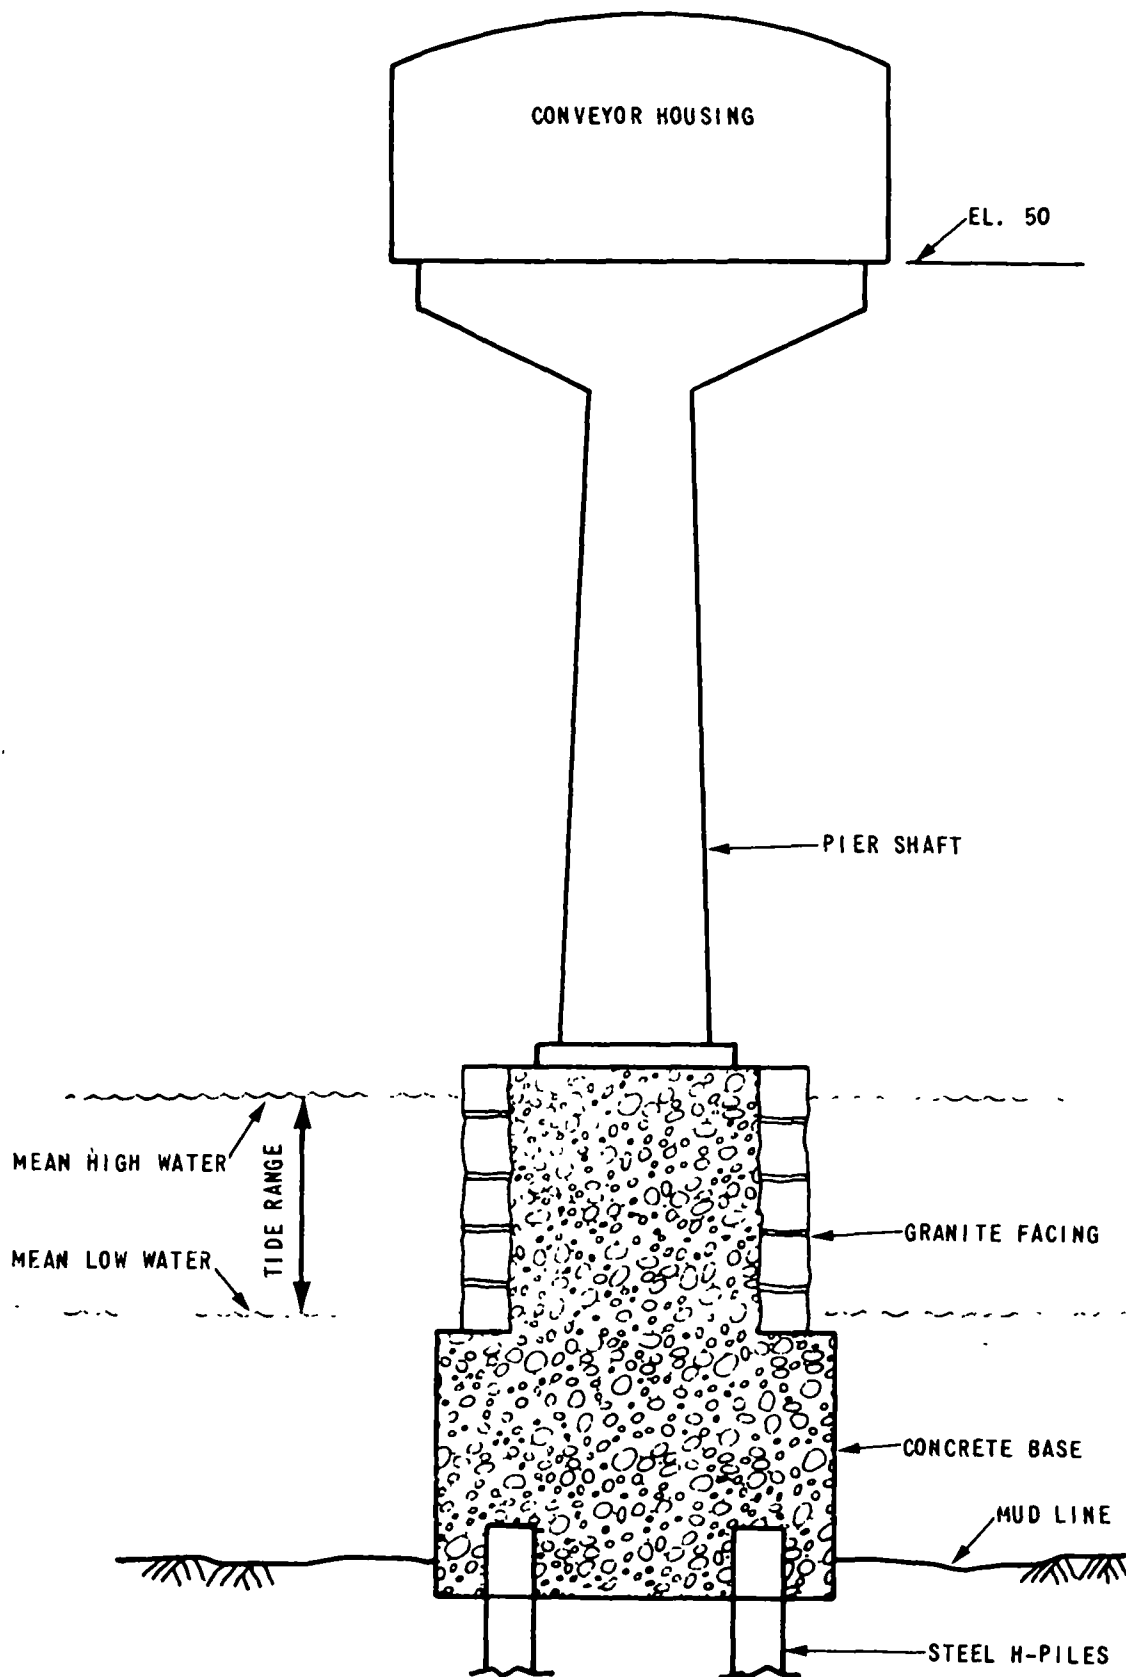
TYPICAL PIER SUPPORT FOR RIVER CROSSING STRUCTURE
